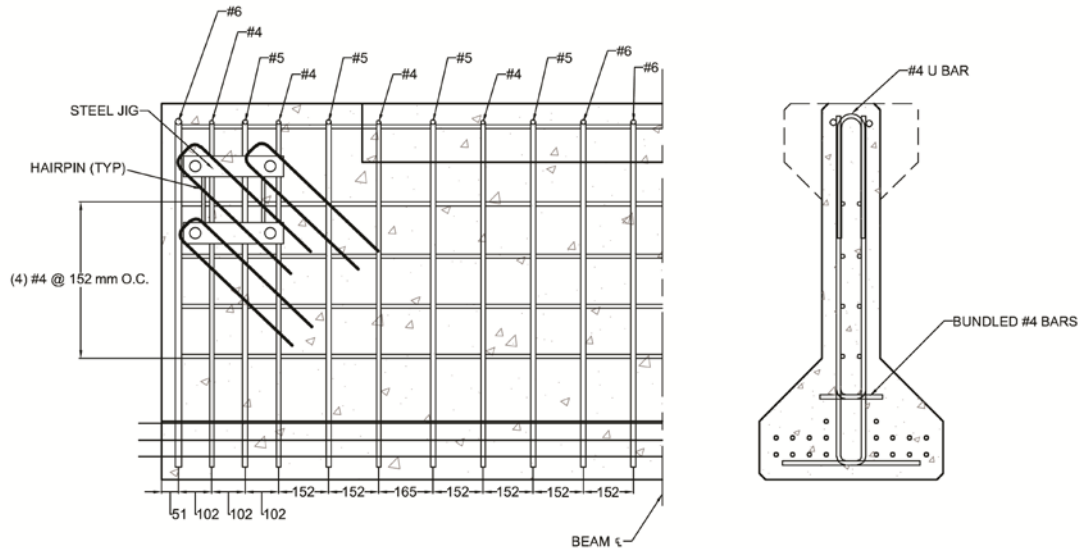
ELEVATION VIEWS OF FULL-SCALE GIRDER FOR CONNECTION TEST.
